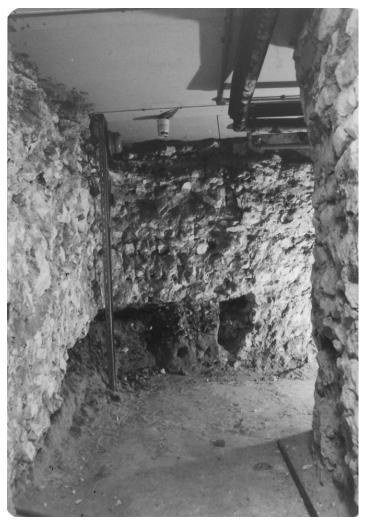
Passage 2 looking west showing the chalk rubble kitchen foundations, the vault and its earth fill.
